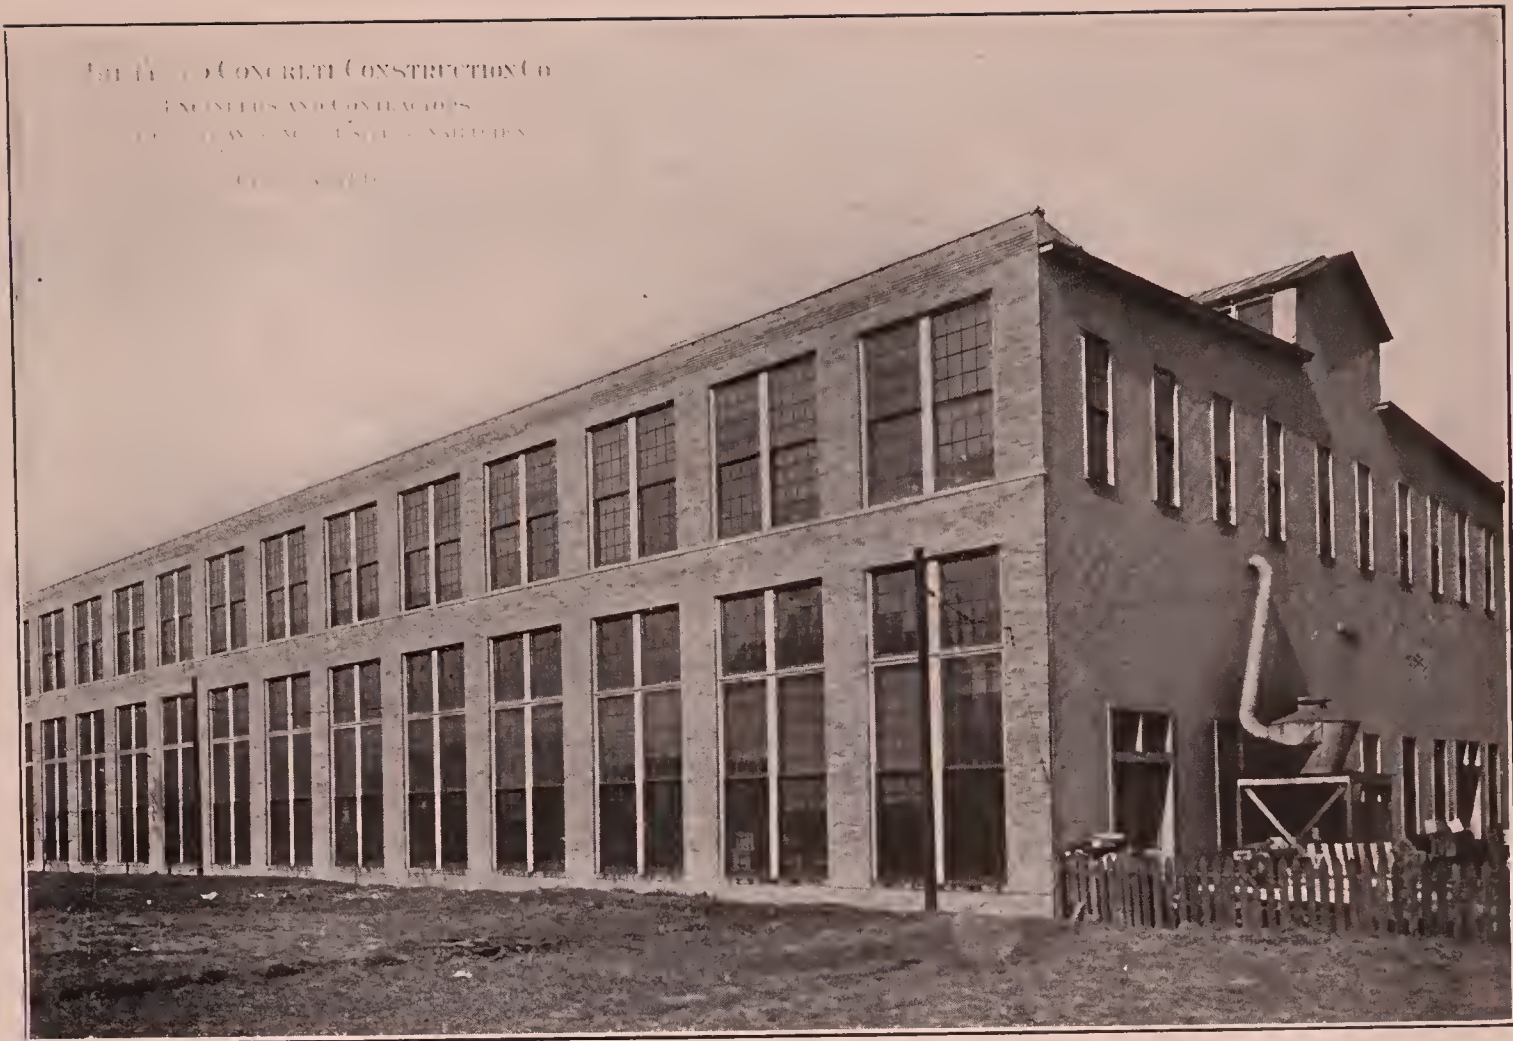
Bullock Electric Machine Shop. Ferro-Concrete Construction Company, Contractors.
